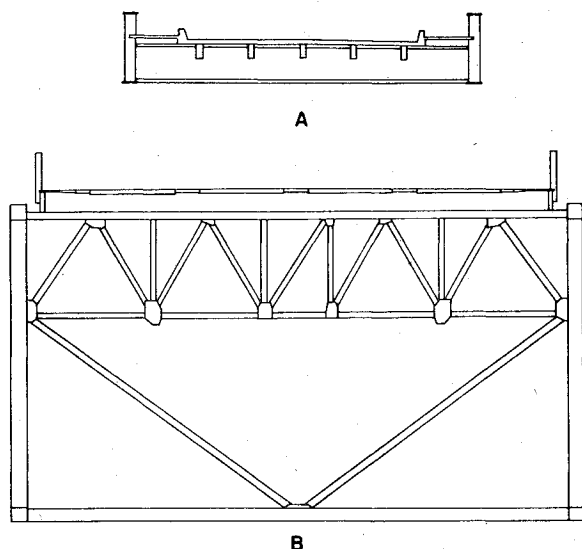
Cross sections of a) original and b) replacement Tacoma Narrows Bridge decks.
